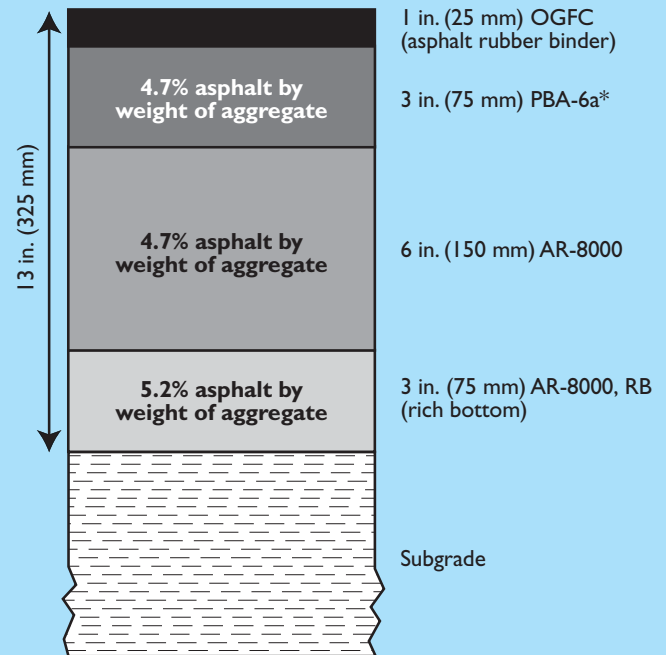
Structural section, full-depth asphalt concrete replacement of structure.
